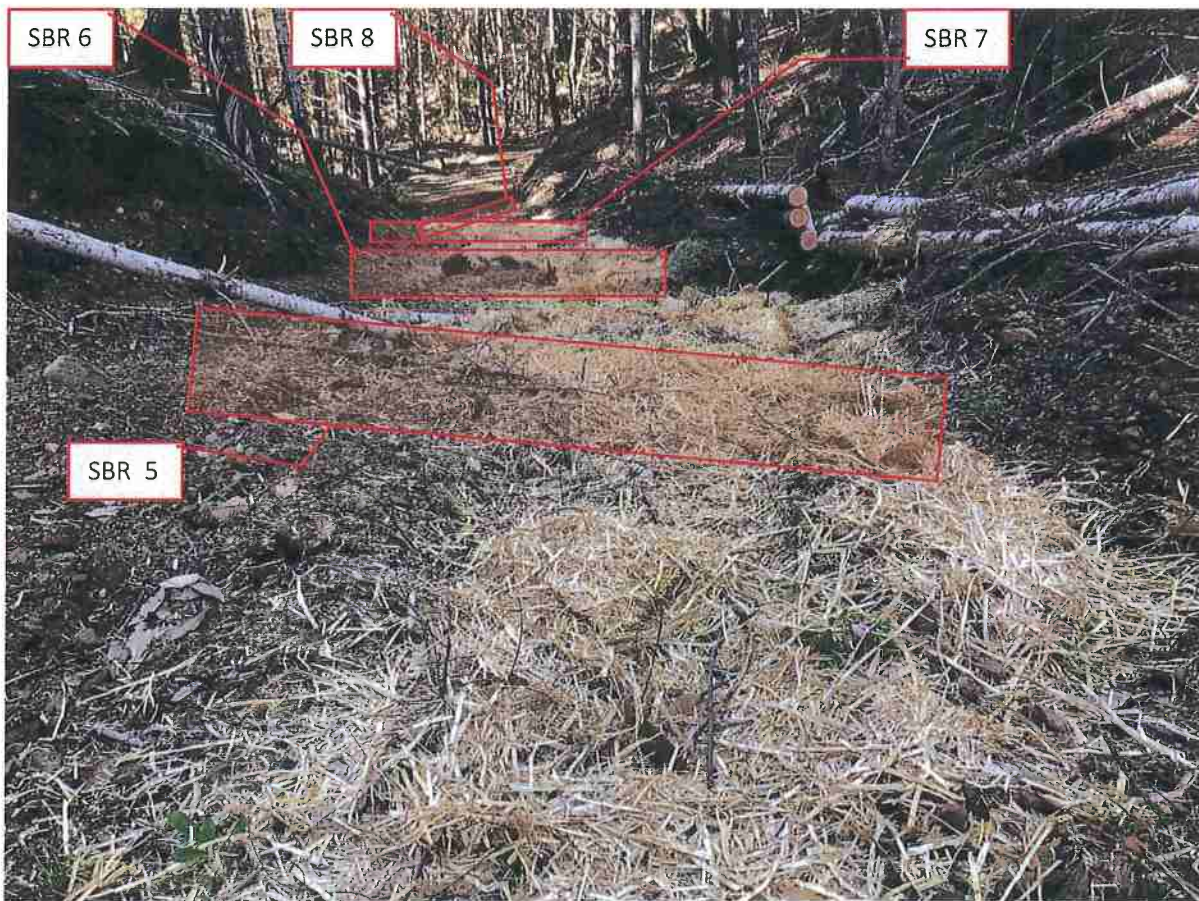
Photograph showing the access road below the impoundment structure where it enters the flow path of the drainage. The access road runs for approximately 80 feet in the drainage and flow path before exiting the drainage toward the east. The red rectangles show the placement locations of four proposed straw bale rows (SBR 5-8).
